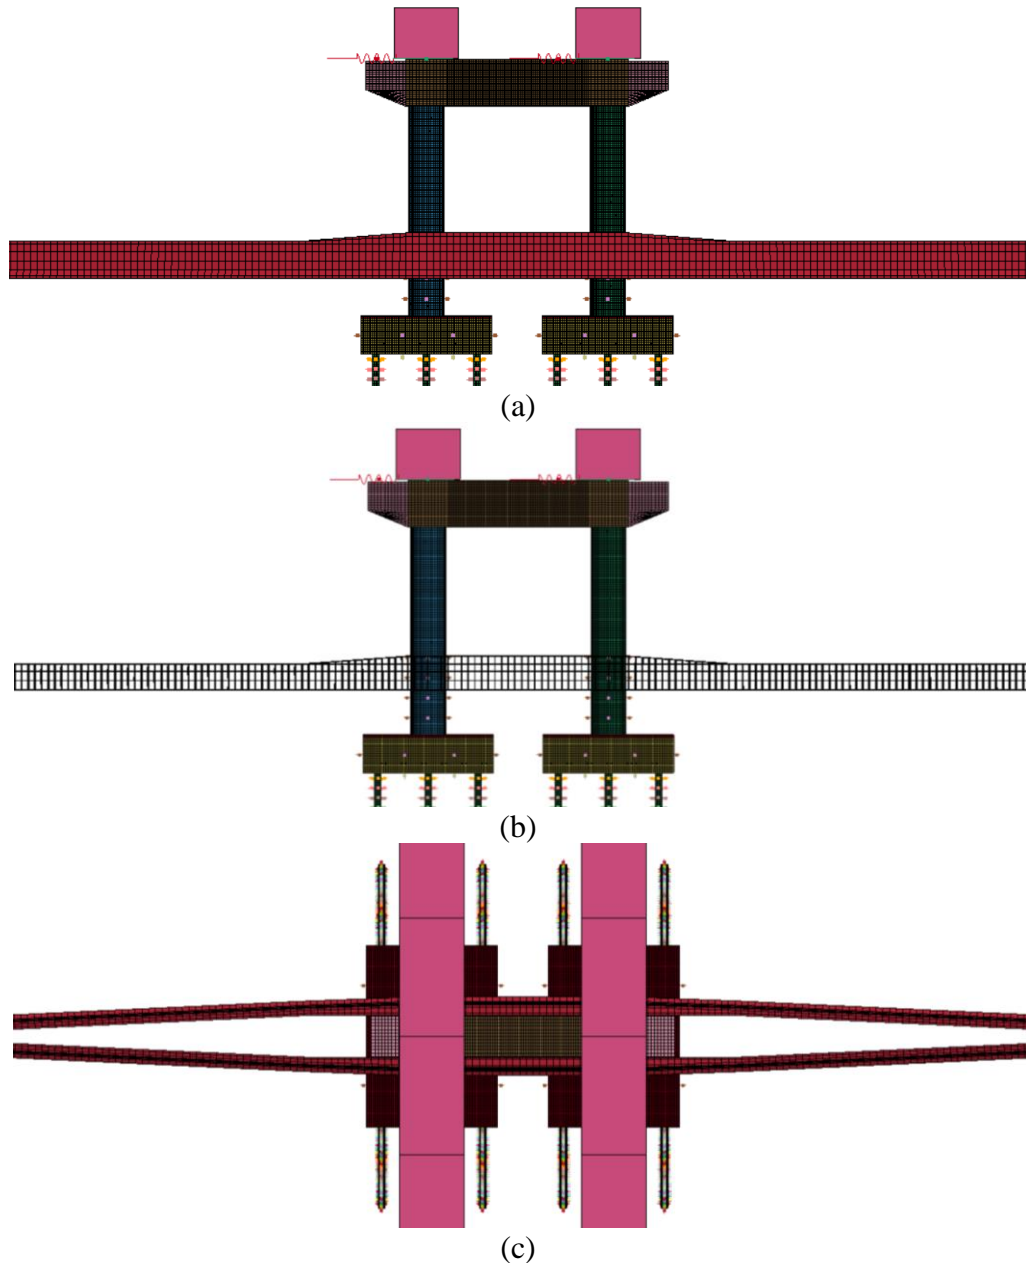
Frame pier model with barrier: (a) side view with concrete, (b) side view with reinforcing steel bar, and (c) top view
